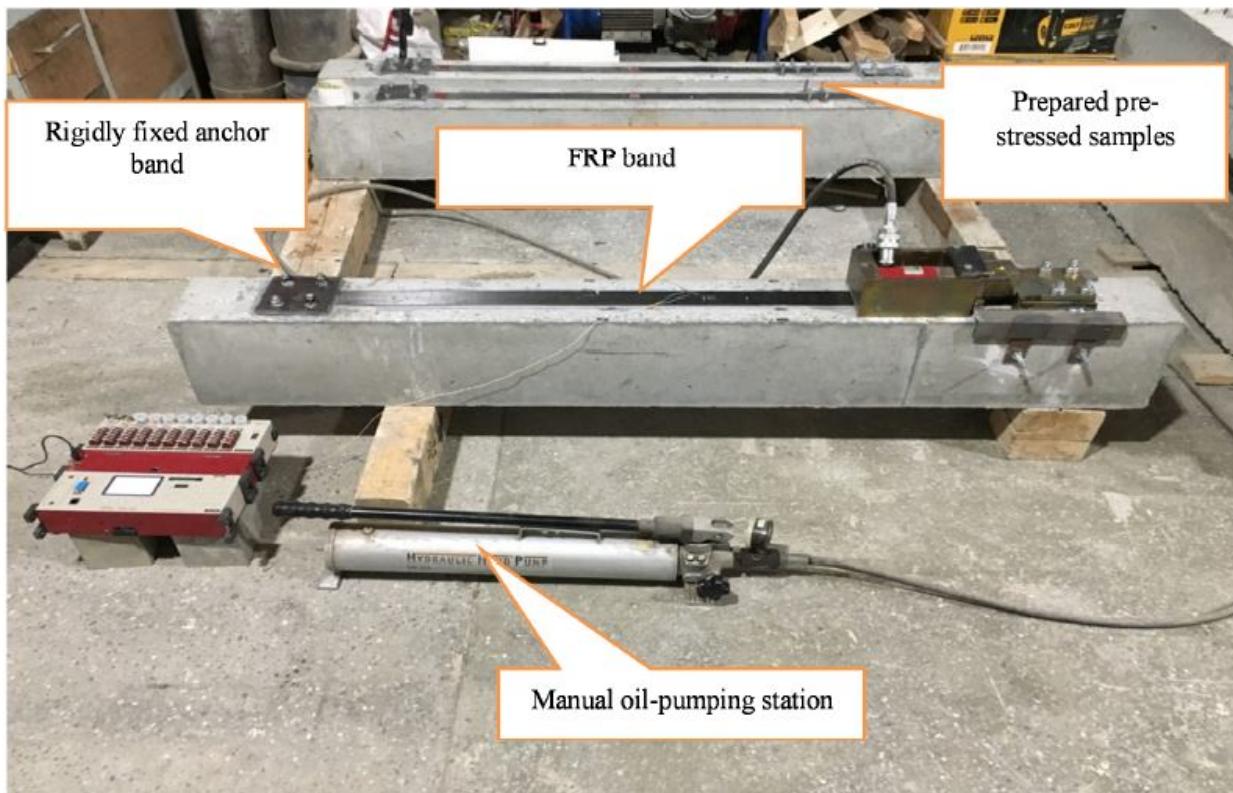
Scheme of work of the TDS-150 to control the loss of prestressing, when reinforcing the FRP of a reinforced concrete beam
